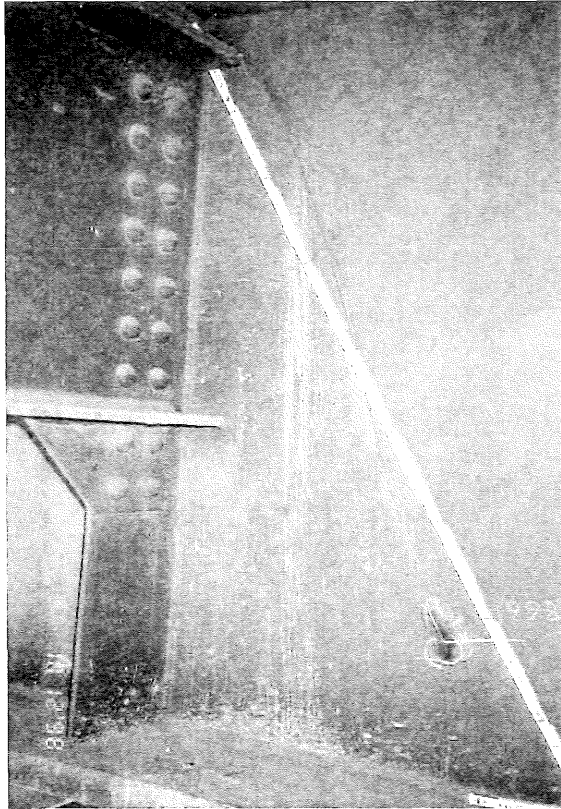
Crack observed in 1998 at Span 9 Girder G2 diaphragm connection extending into web plate.
